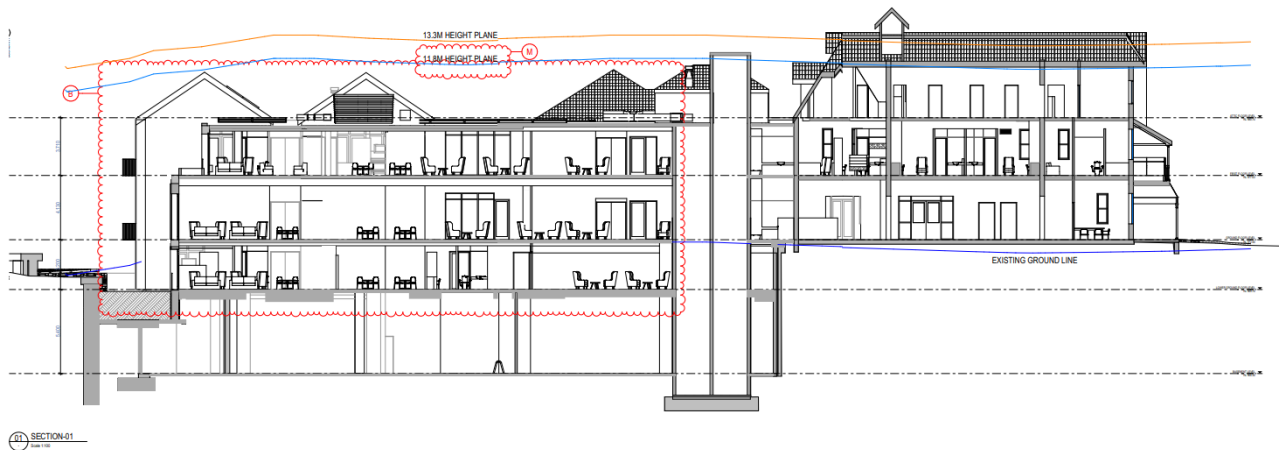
Annotated section 1 showing roof element of the existing Ritz building A1 and dormer sitting above the height plane (Source: PBD Architects)
